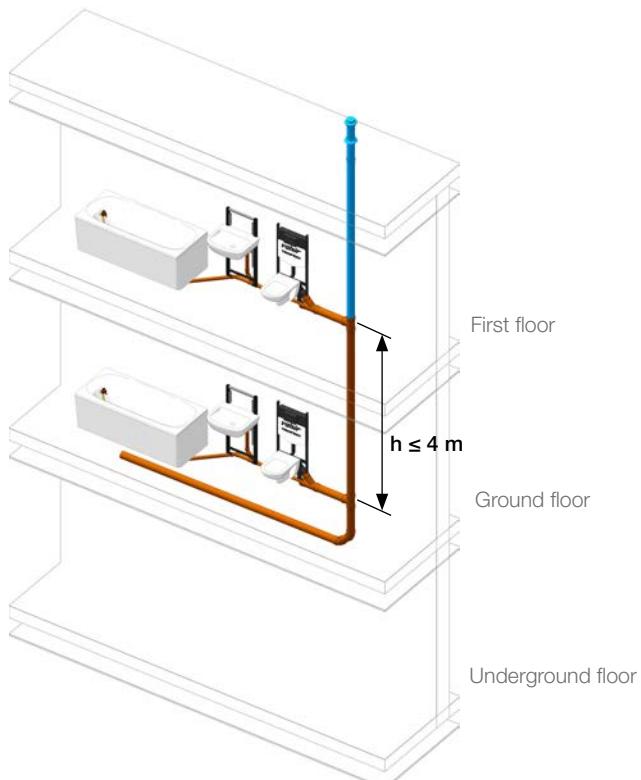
Primary ventilation, 2-storey building ($h \leq 4 \text{ m}$), collector on the ceiling of the underground floor.
